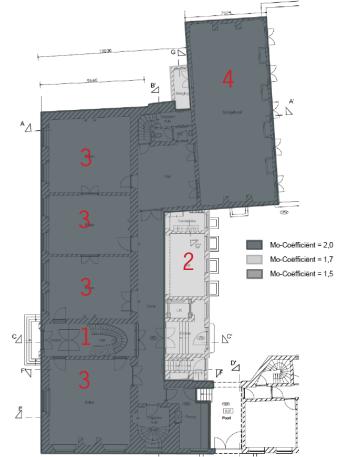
Floor plan ground floor (Source: NIBE, 2008)
